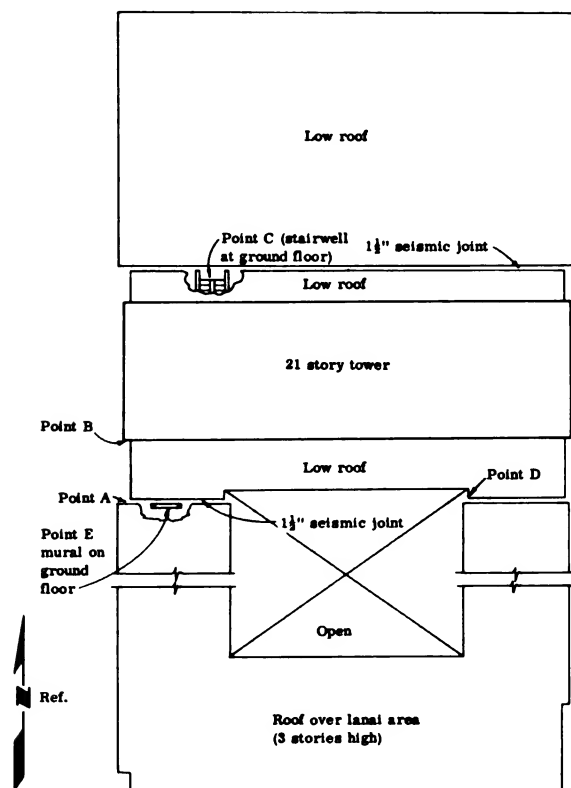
Sheraton-Universal Hotel. Key plan of building showing location of damage.
